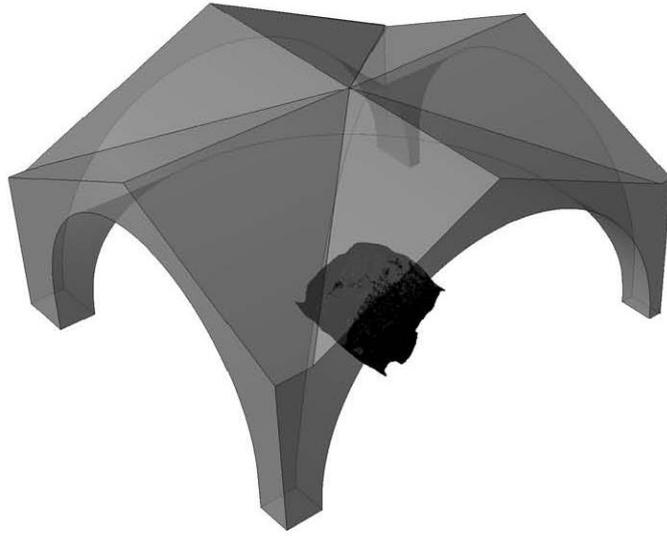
Reconstruction of cross vault showing original position of fragment A
